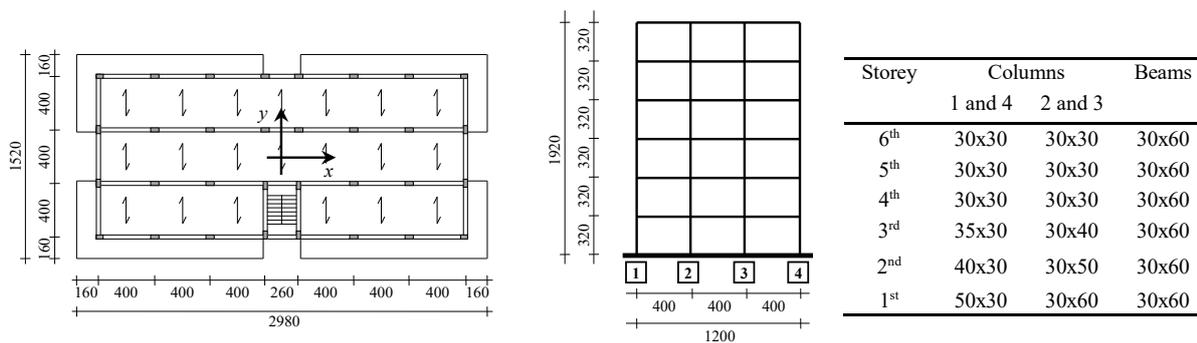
Features of the analysed RC frame: (a) Plan layout of the building, (b) geometrical scheme of the frame, (c) cross-sections of the frame members
